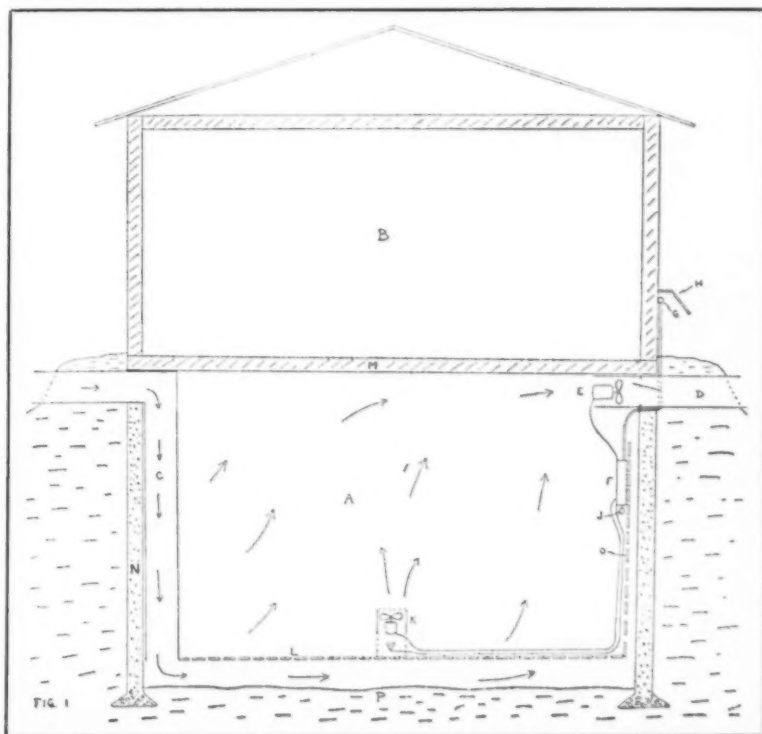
A representative underground storage equipped with automatic ventilation controls. A—Storage. B—Packing floor or dry storage. C—Air-inlet duct. D—Air-outlet duct. E—Exhaust fan. F—Control panel. G—Outside sensitive air bulb. H—Protecting cover for air bulb. J—Inside sensitive air bulb. K—Air stirring unit. L—False, slatted floor. M—Insulated ceiling. N—Concrete walls. O—False, slatted walls. P—Earth or concrete floor.
